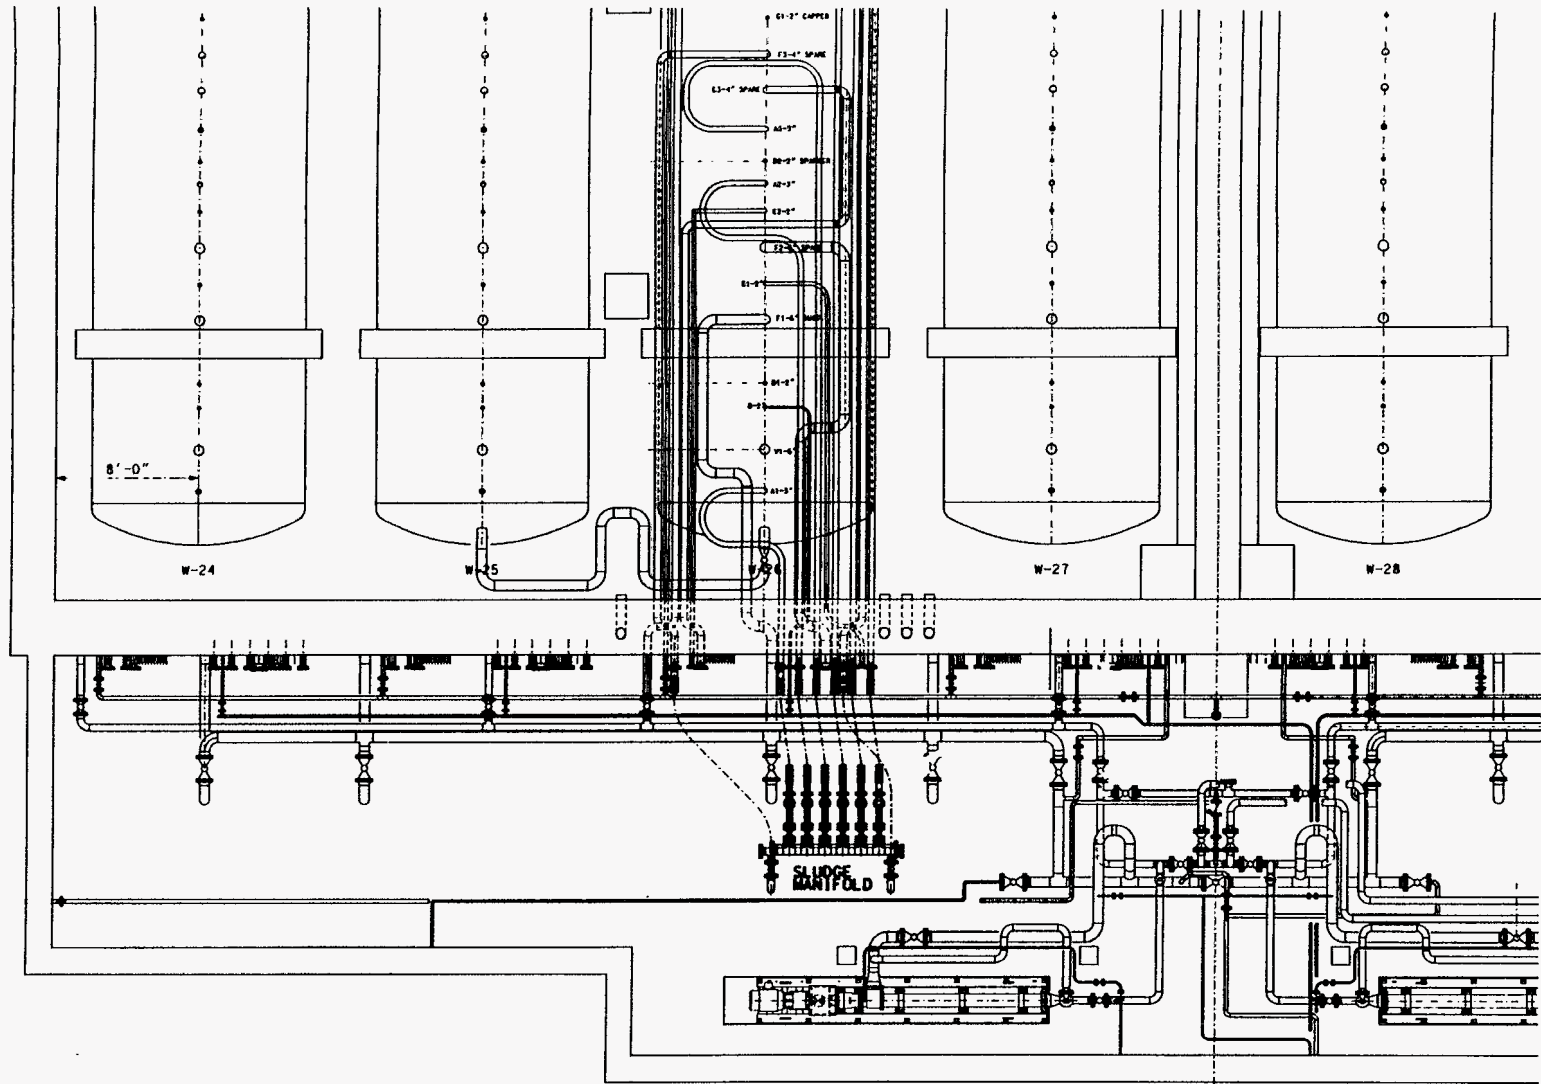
Schematic showing hookup of new sludge manifold system to waste storage tank W-26 and existing piping in west side of pump and valve vault. Two Moyno pumps are located near center of vault and toward its outer wall, and sump pump is located in center of vault and toward its inner connecting wall with east and west tank vaults (see Fig. 2.2).
